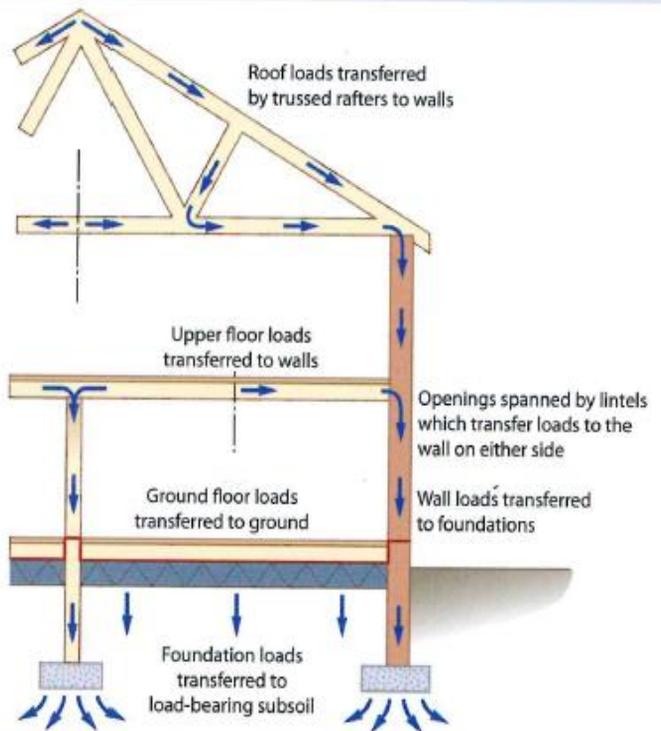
A dynamic load is transferred from the roof to the foundations through the walls and floors
